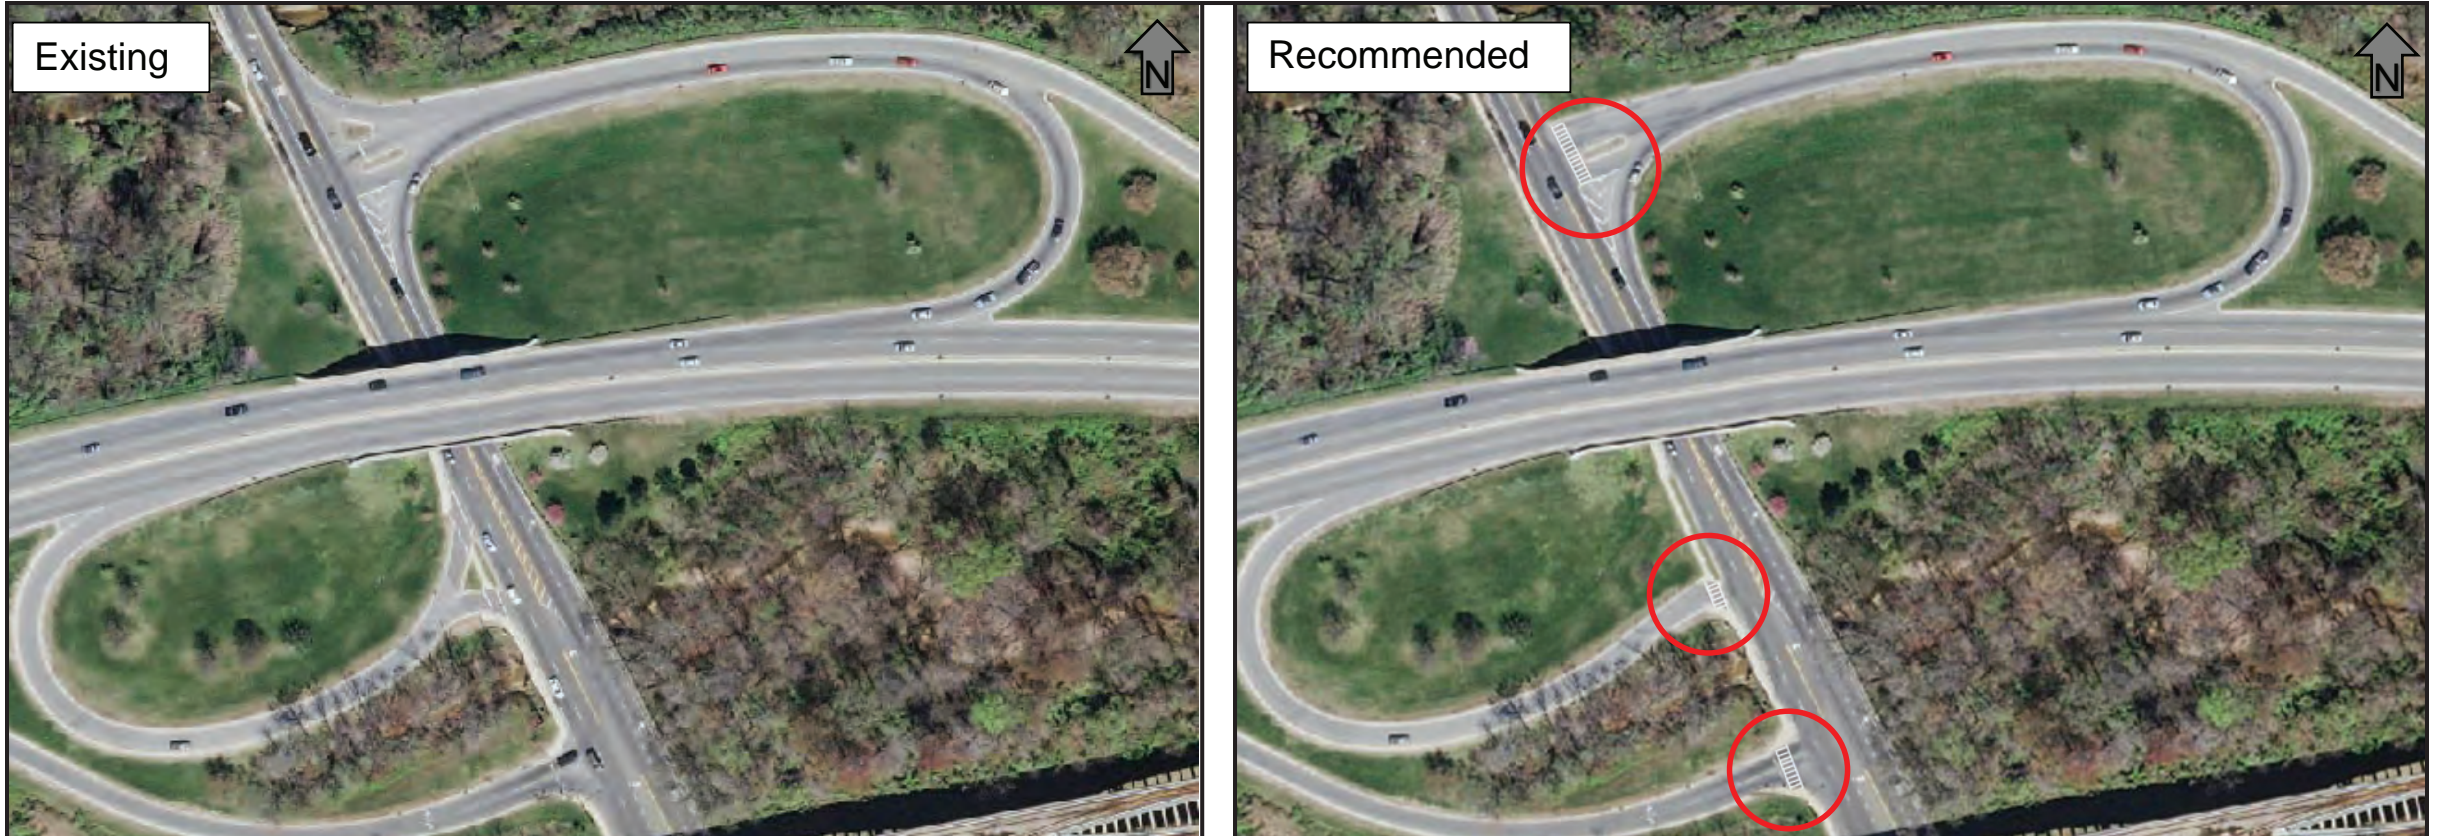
Recommended Suitland Parkway Ramp Improvements at MD 5
